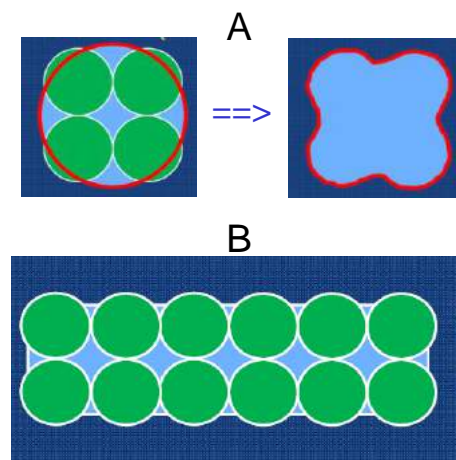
Four piles replacing a single pile and twelve piles replacing a barrette (after Baquerizo 2015)
